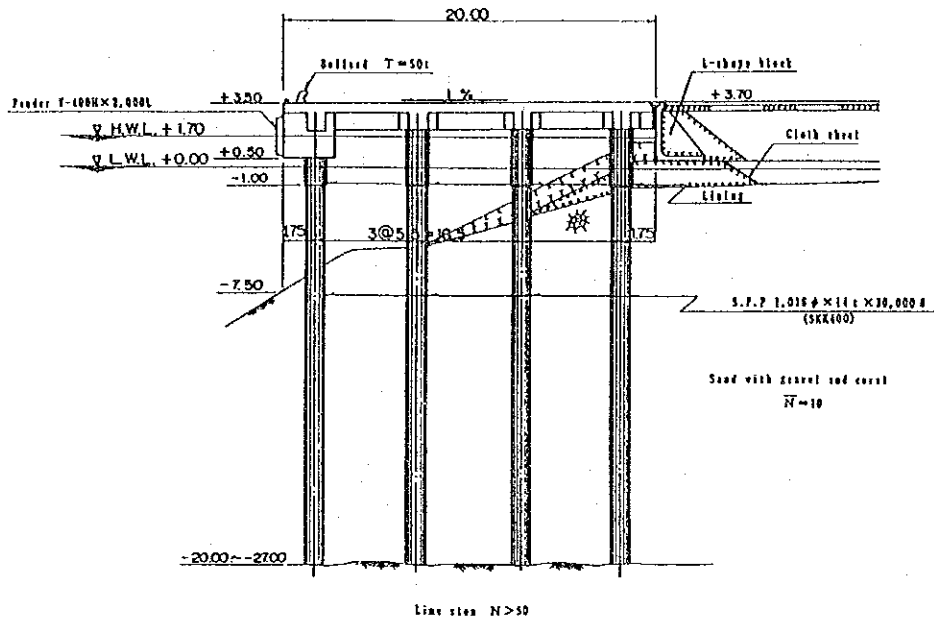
Standard Cross Section of Heavy Cargo Berth
